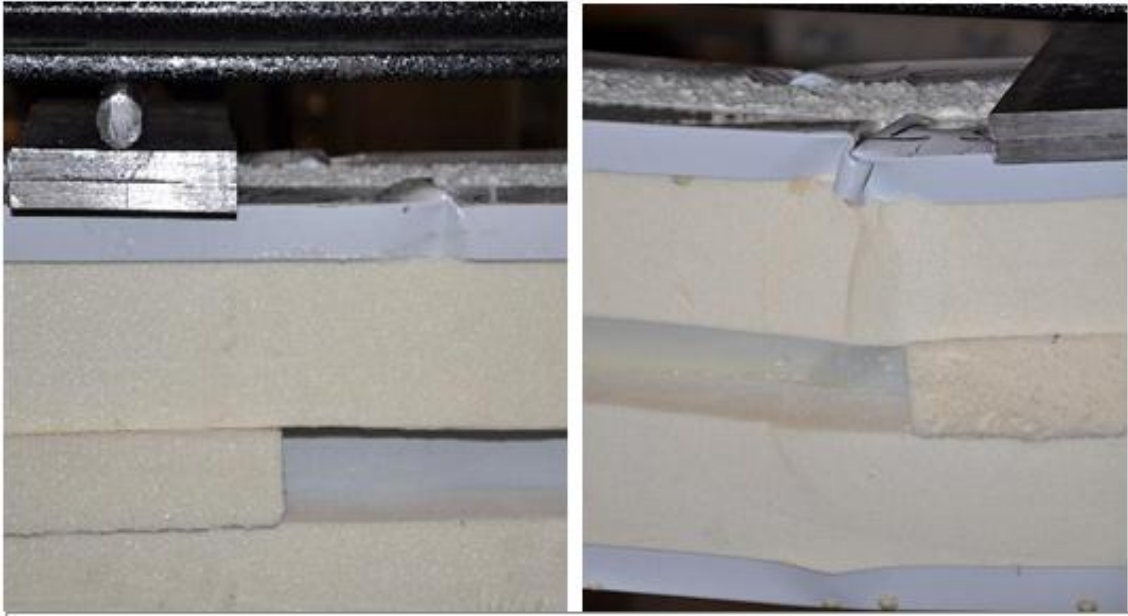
Local flange buckling failure between the loading points (Series 3\_2)
